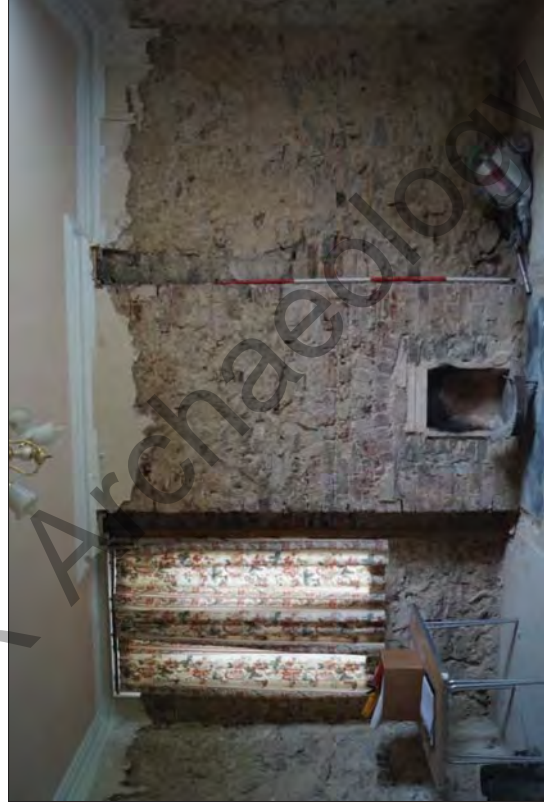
Farmhouse - Ground floor - Room 5 -
